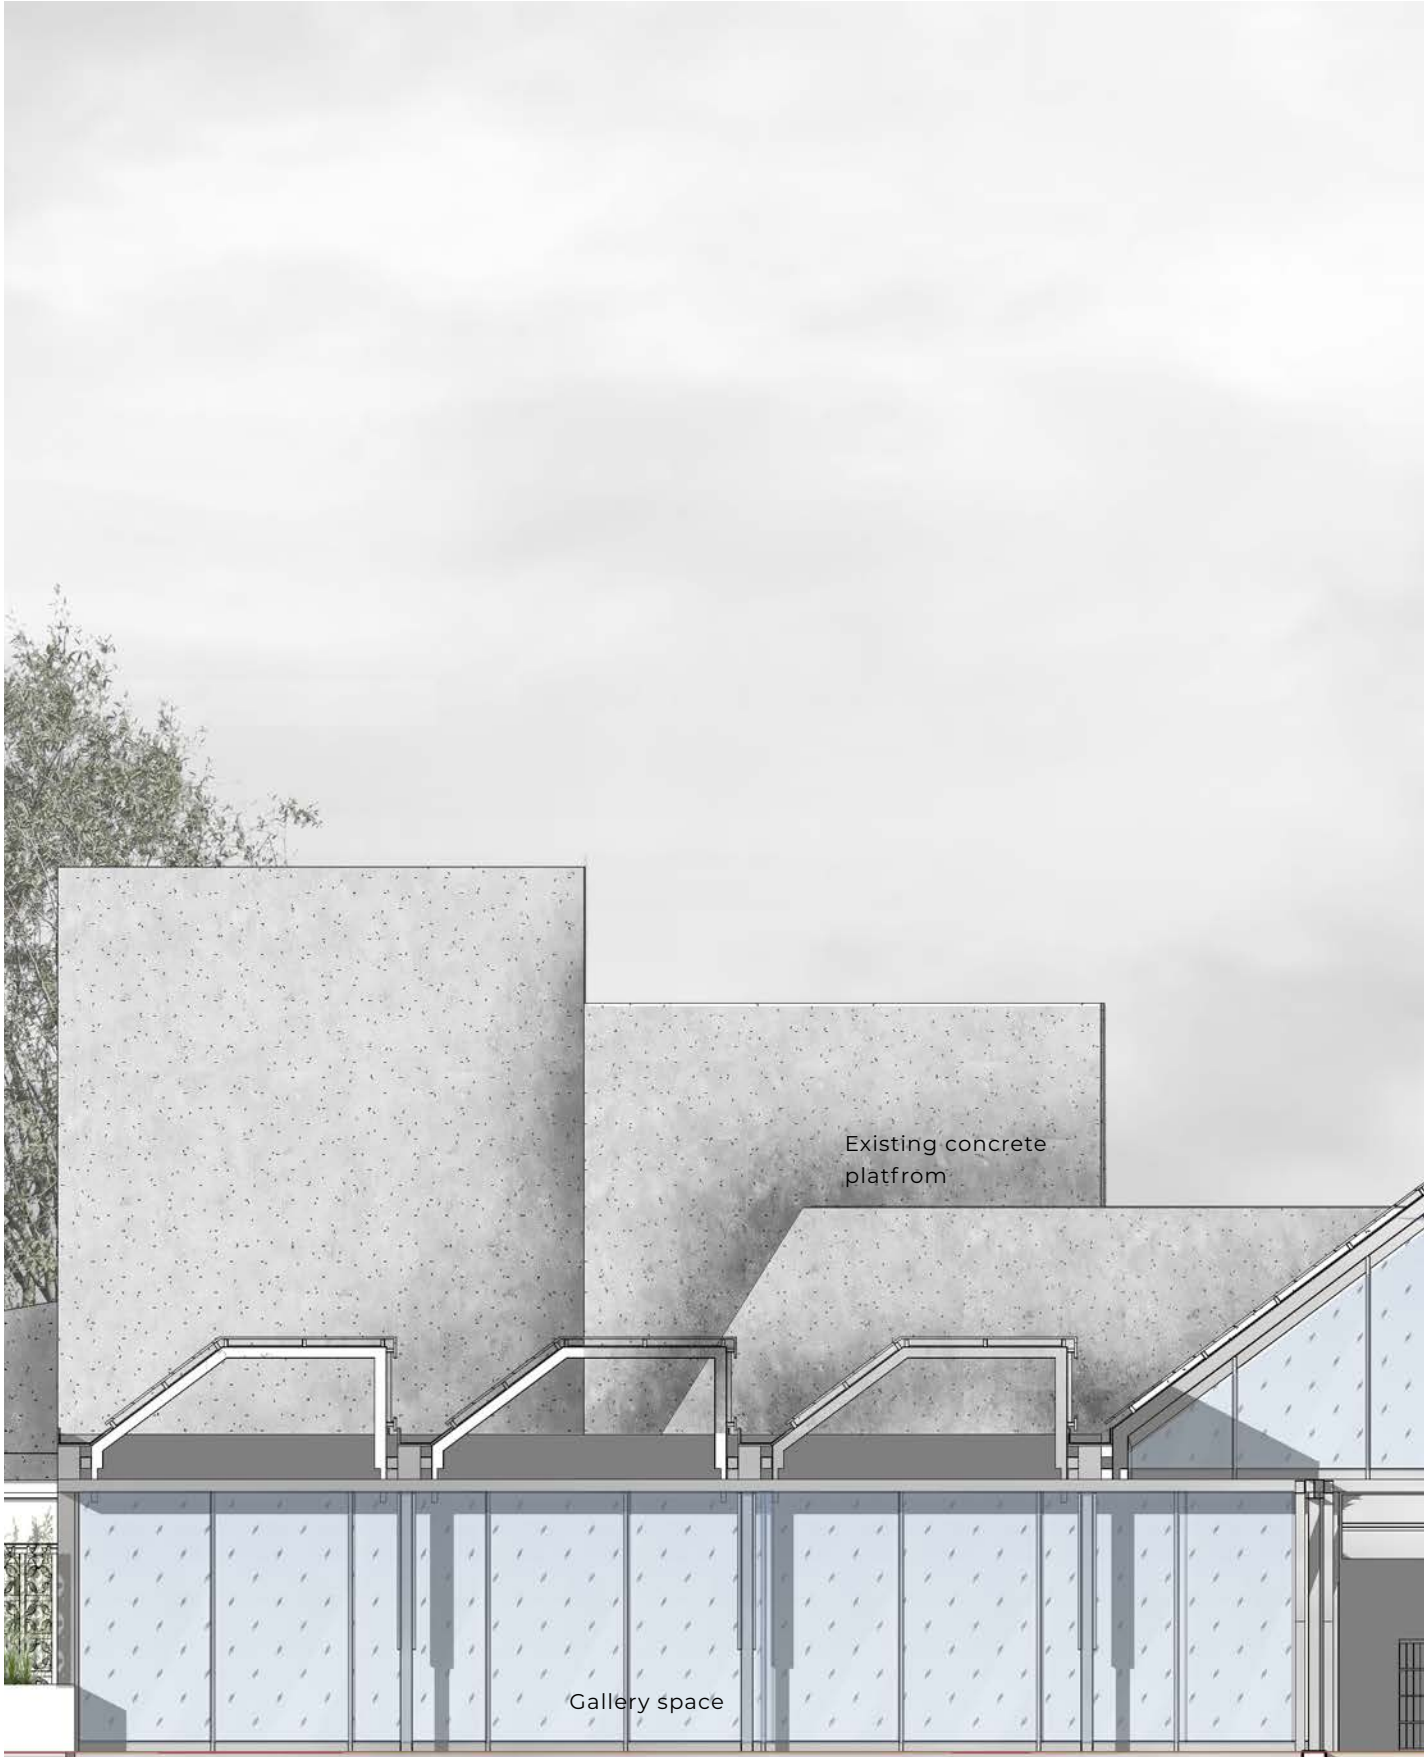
Portion of west elevation (Scale 1:100, original drawing 1:100)(Author:2018)
